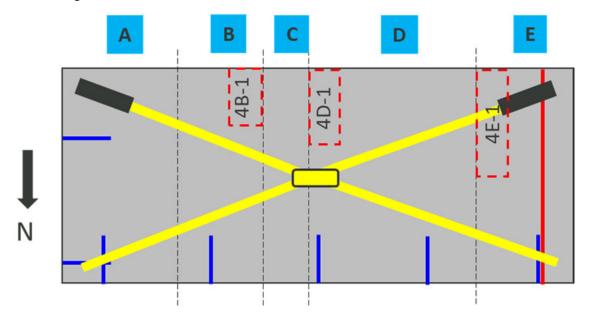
Plan view looking down at the incident slab and indicating the location of slab samples 4B-1, 4D-1, and 4E-1 with respect to the incident failure pattern.
